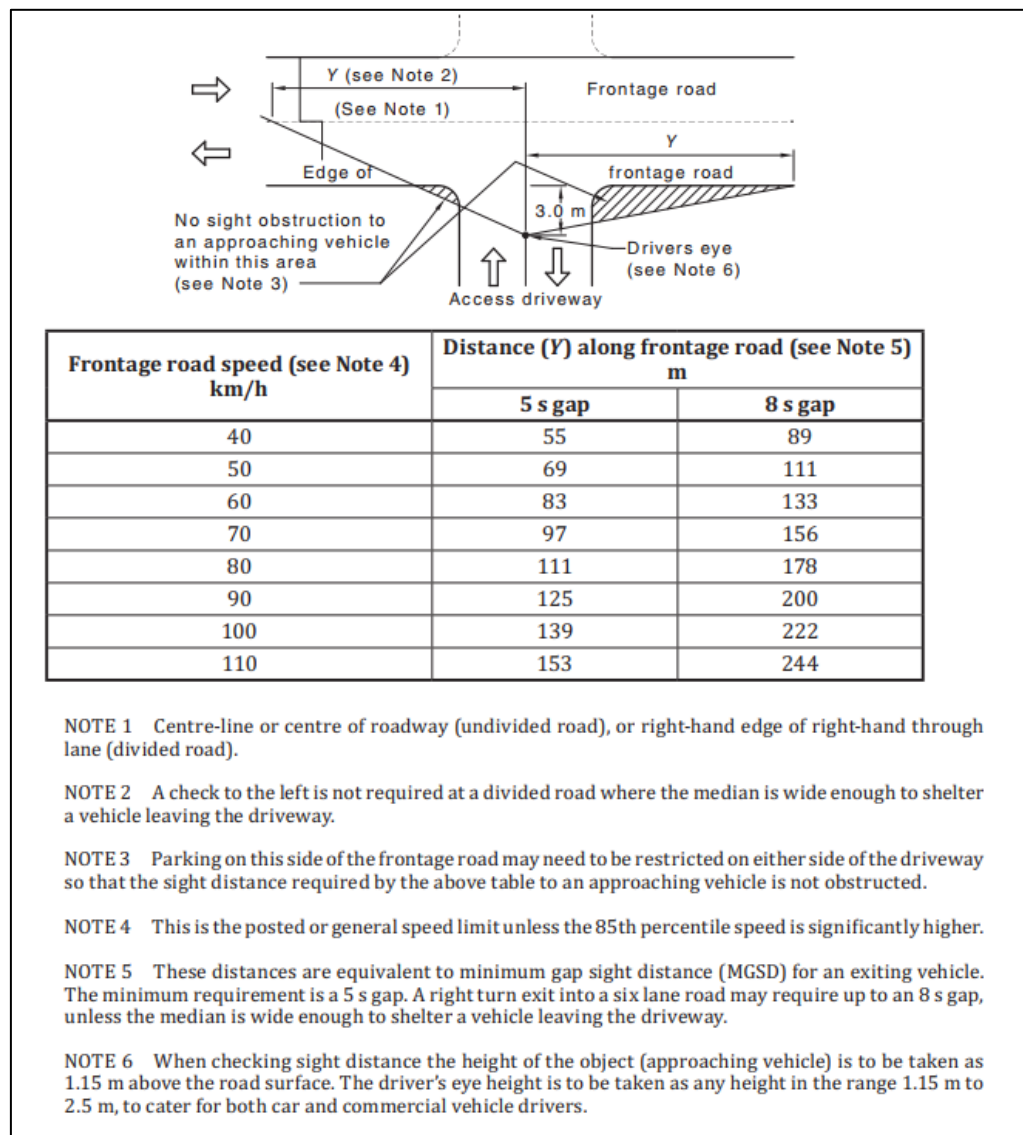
PROPOSED SITE DRIVEWAY CONDITIONS
